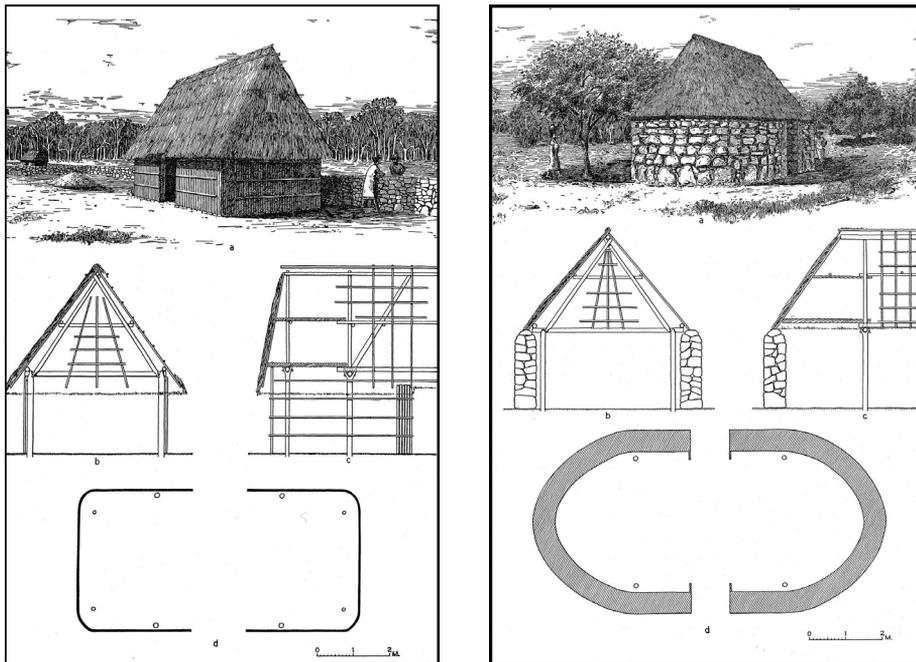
Left: Rectangular plan with flattened ends and a pole wall. Right: apsidal plan with masonry walls. Both have *ramada* roofs. After Wauchope 1938
